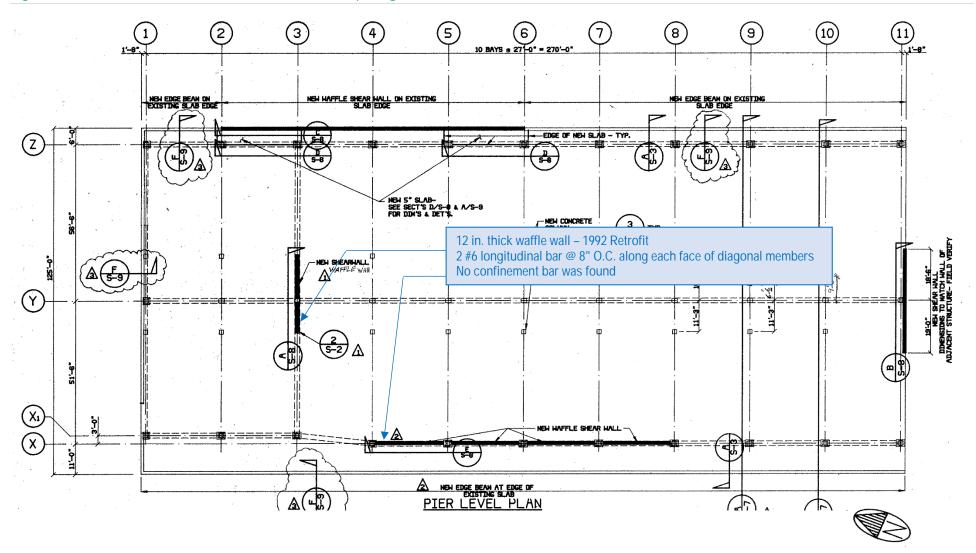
Steel reinforcement found at wall destructive openings – Pier Level
